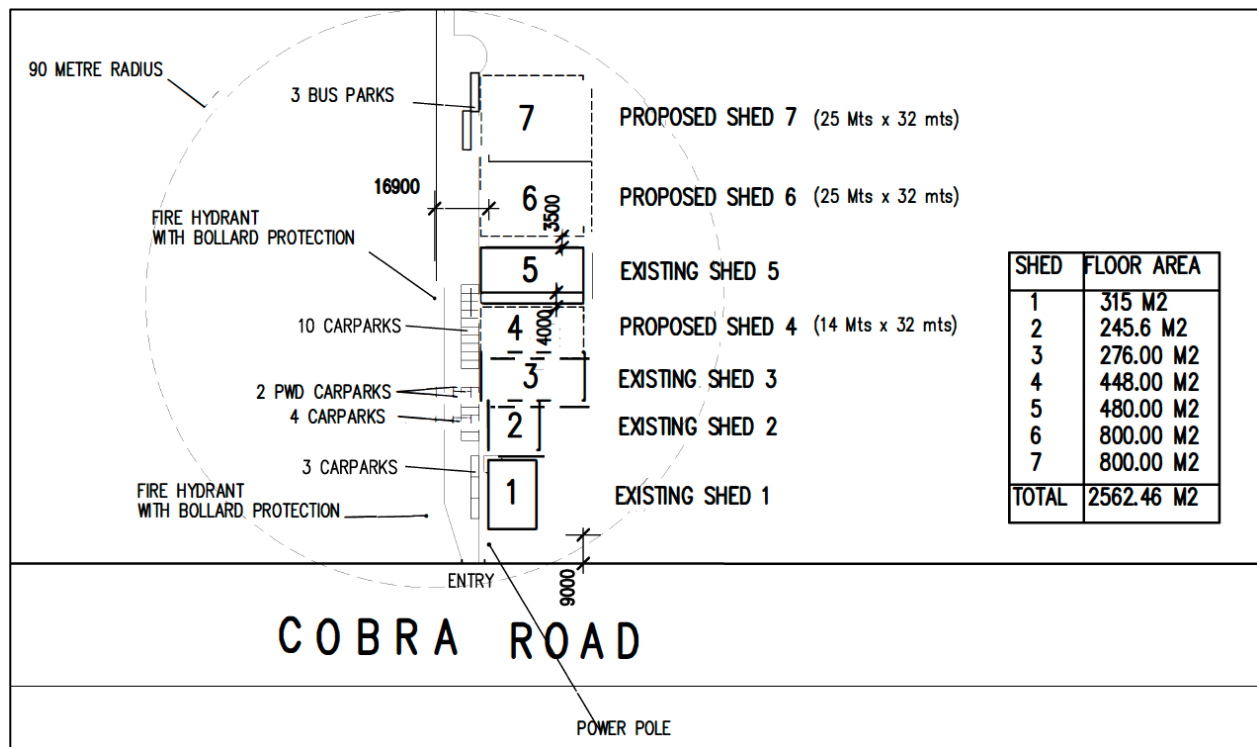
Extract from Development Plans – Site Layout Plan of Tourist Attraction
